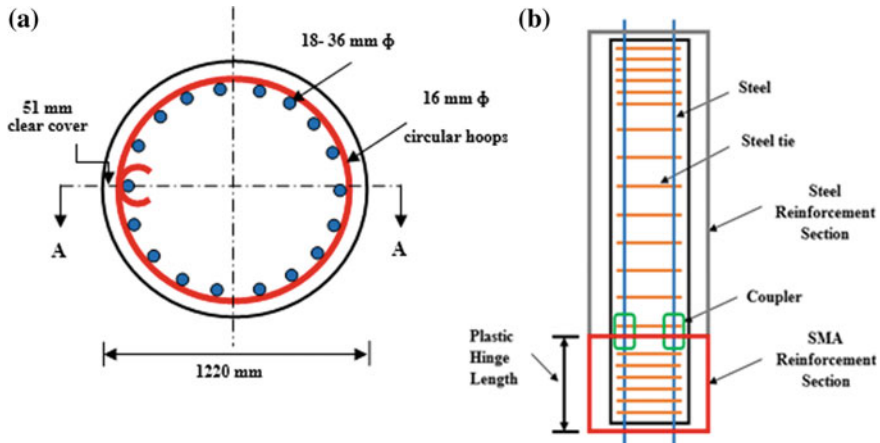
Geometry and reinforcement details of SMA-RC bridge pier
